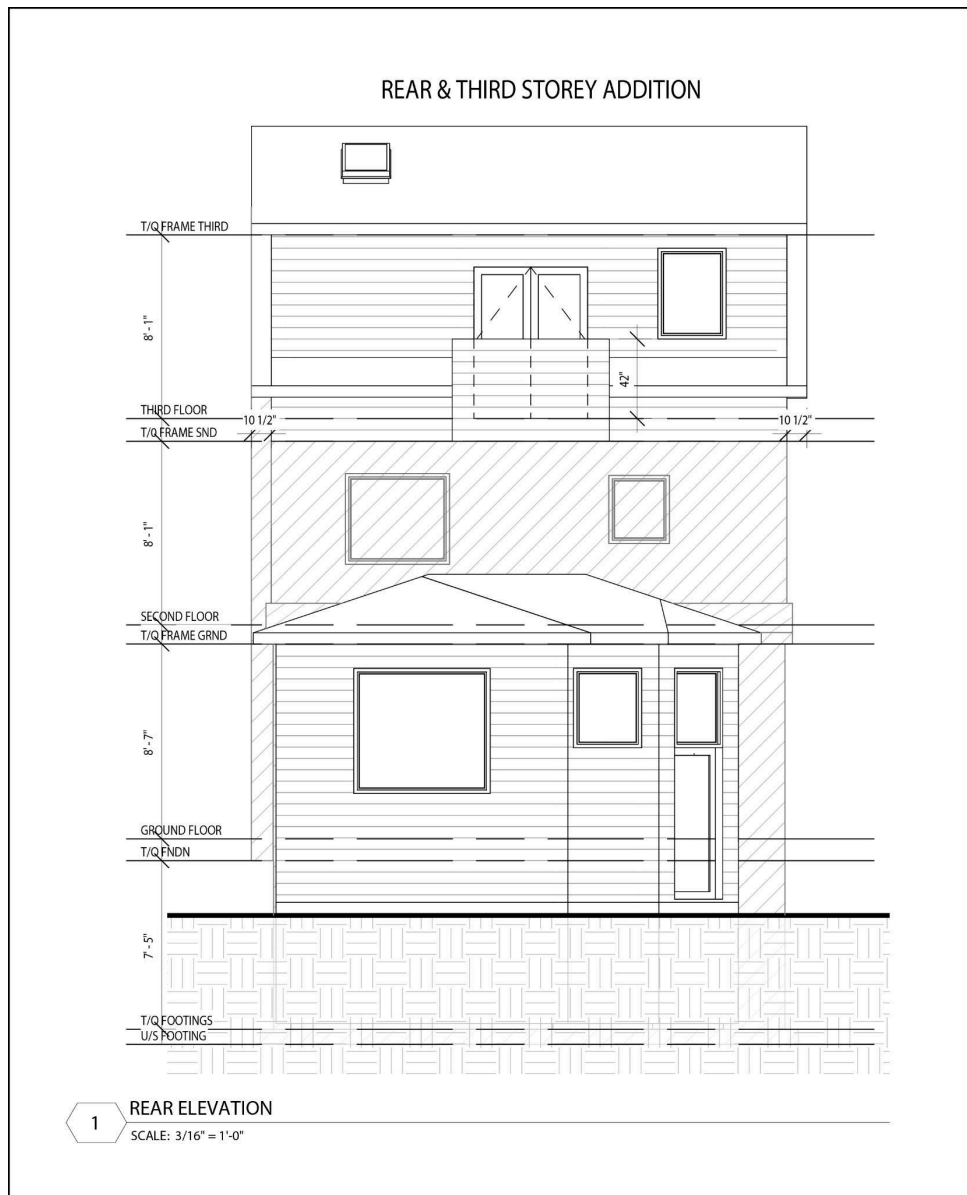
Rear elevations showing minimal windows on the rear addition elevation.
